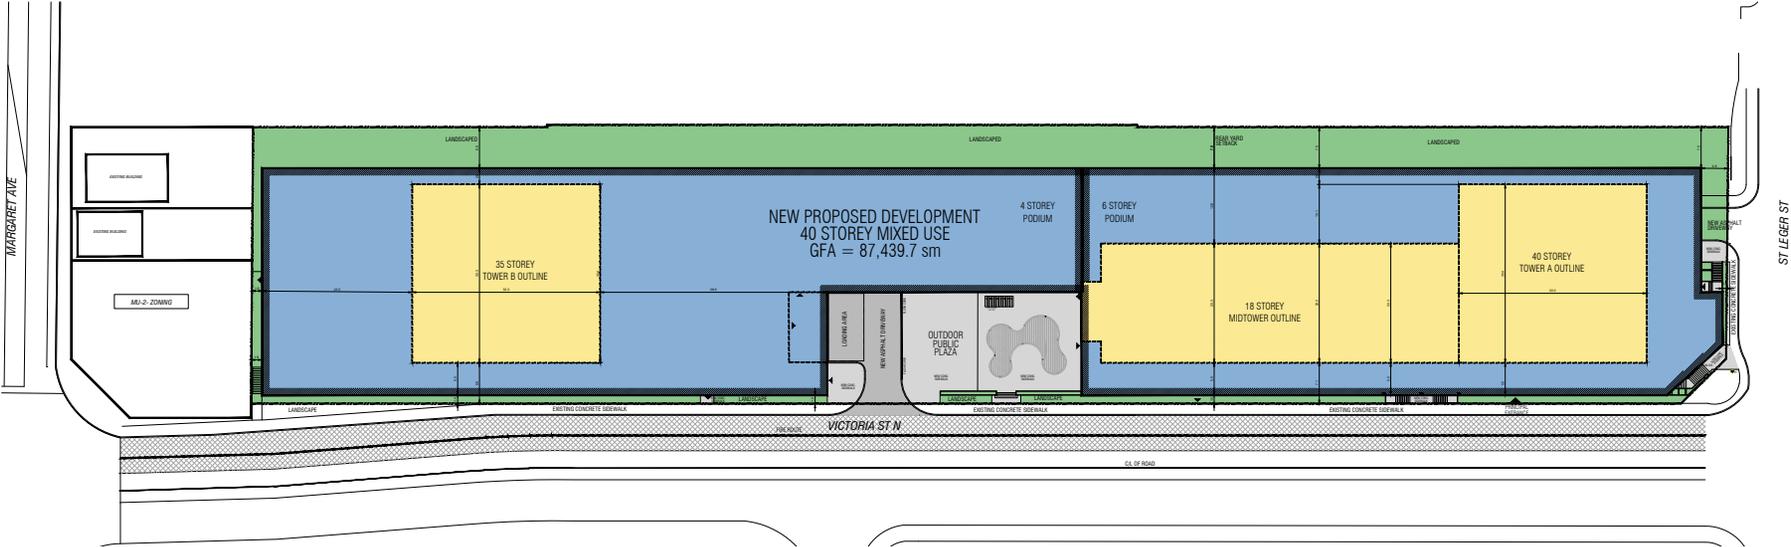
Proposed Site Plan (Reinders + Low, December 8, 2023)
